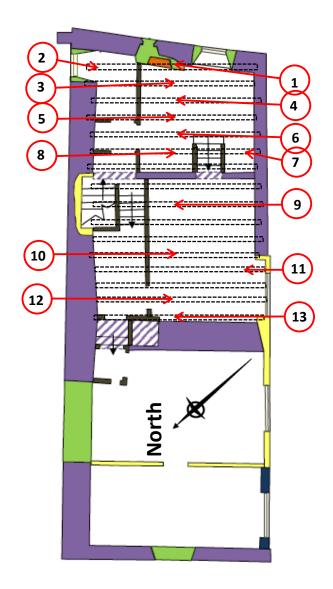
Plan at roof level of the Gatehouse to help locate sampled timbers (from Parker 2013 after Smith Gore Chartered Surveyors)
